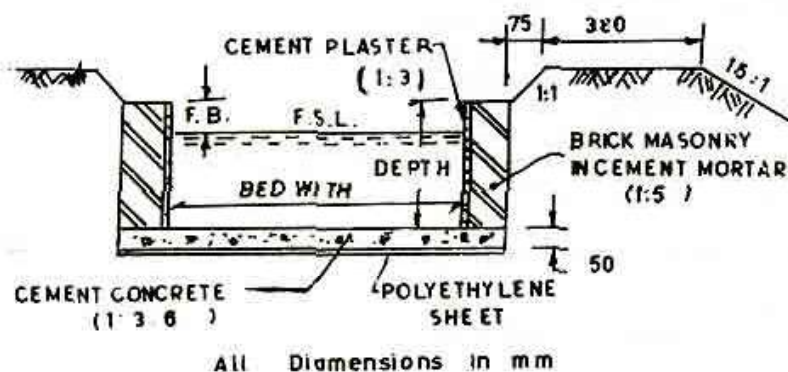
Typical Cement Concrete And Brick Masonry Section
